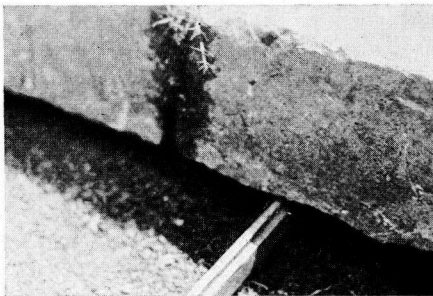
A 2½-in. Rod Extending 5 ft. under the Pavement
